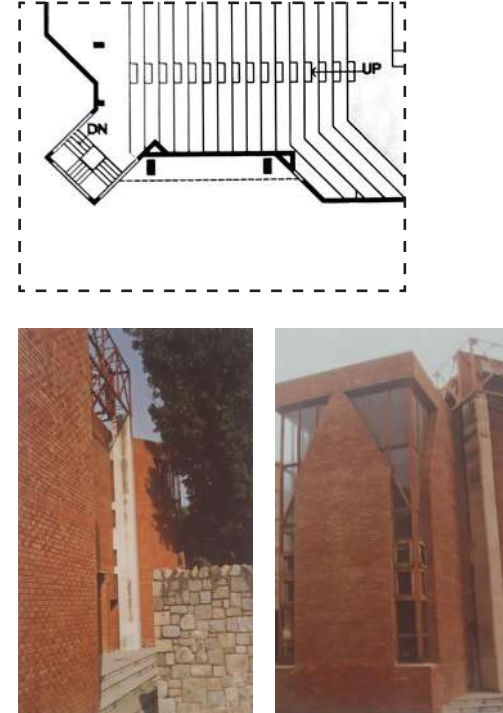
Images showing the columns places outside and the separation between the column and wall
